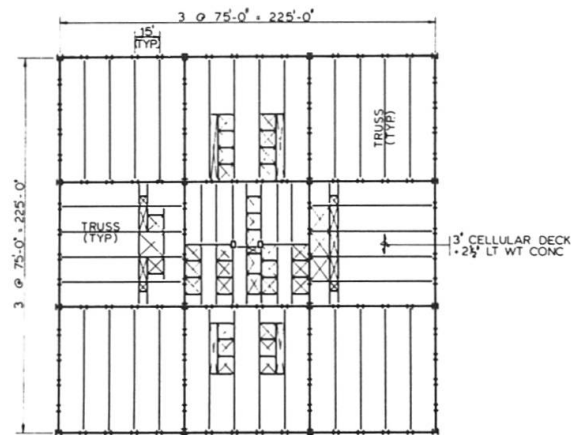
Typical framing plan (levels 1 to 50) – Sears Tower
